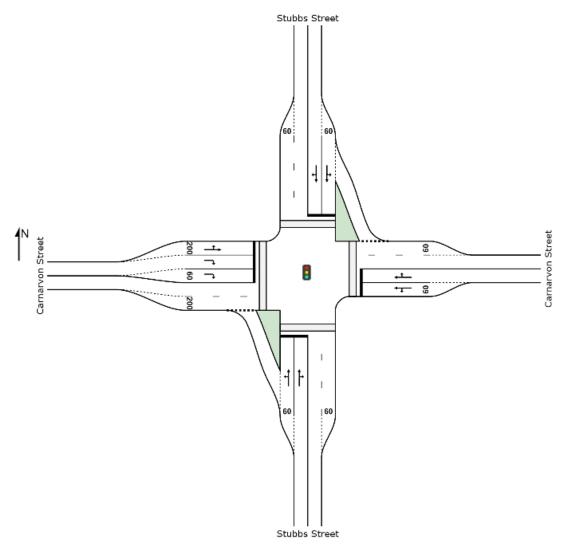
Intersection of Carnarvon Street and Stubbs Street
